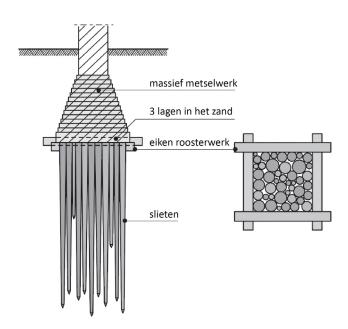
Wooden pile foundations with short thin piles (slieten)(CURNET/SBR, 2007).
